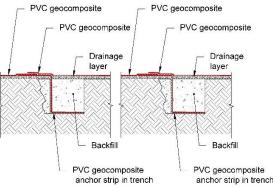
Geocomposite anchored by PVC anchor strips embedded in trenches at Bulga GFED (2016)
